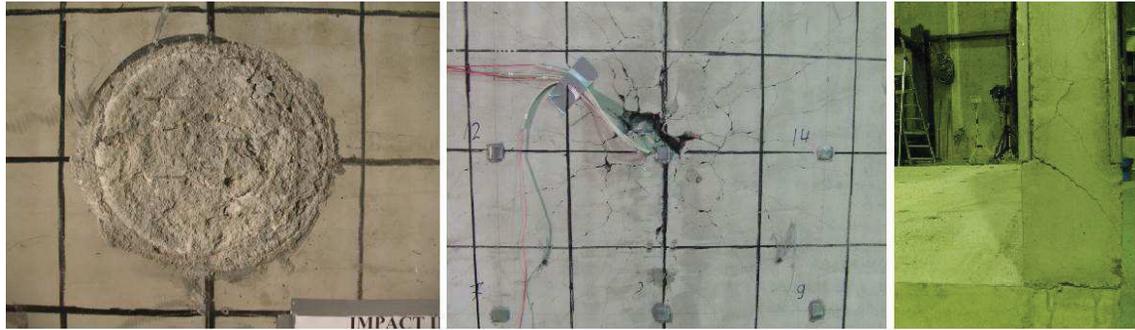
The front (left) and the backside (middle) of the front wall around the hit area after test C. Right: Cracks near the junction between the front wall and the floor after test C.
